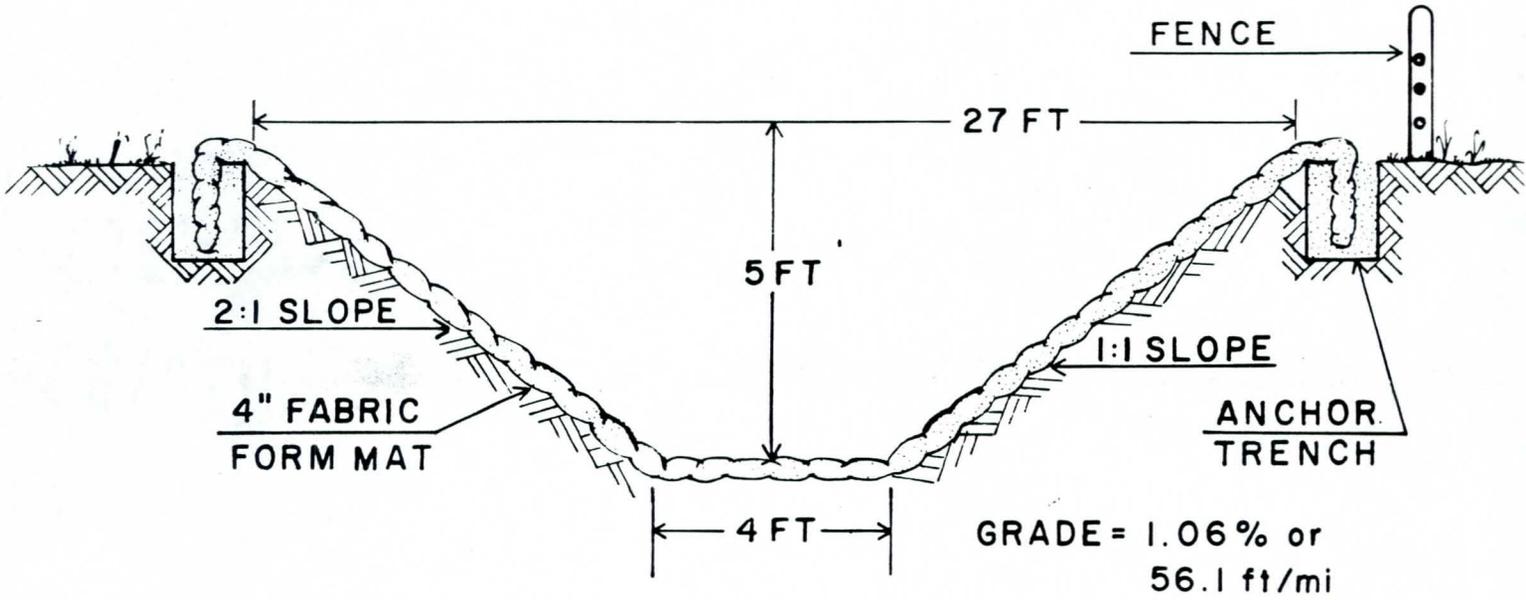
Arrangement of Test Sections and the Ditch Gradient.
